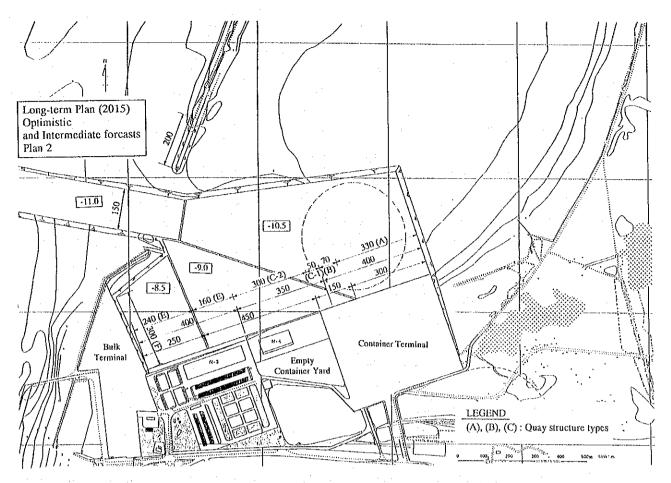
Location plan of quay structure by type, Case H-2, M-2
